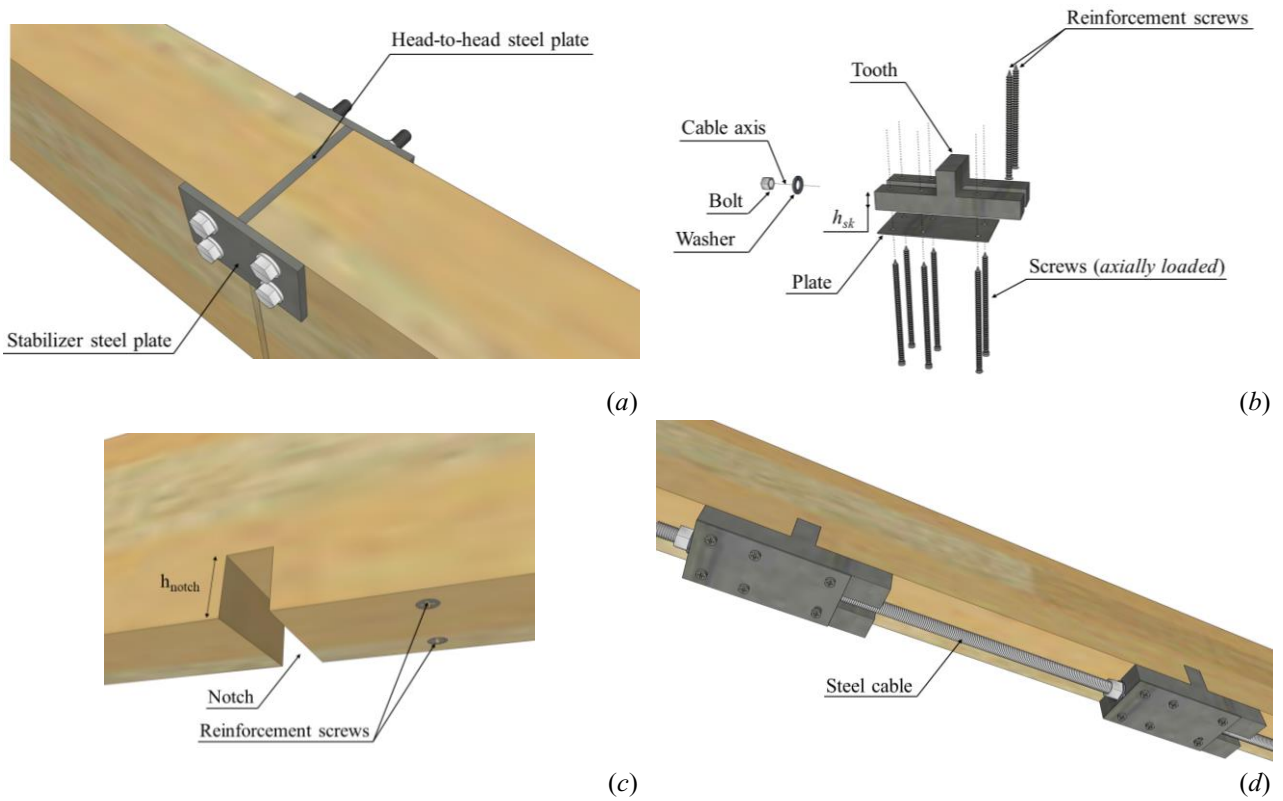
Details of the hybrid timber-steel beam: (a) joint plates, (b) steel shear-key, (c) timber notch and (d) anchorage of shear keys on timber beam.
